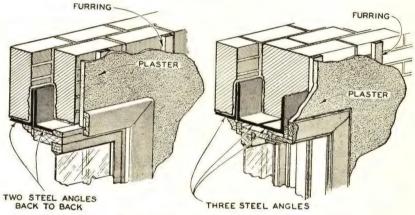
Steel Angles Forming Lintel in Eight-Inch Brick Wall
